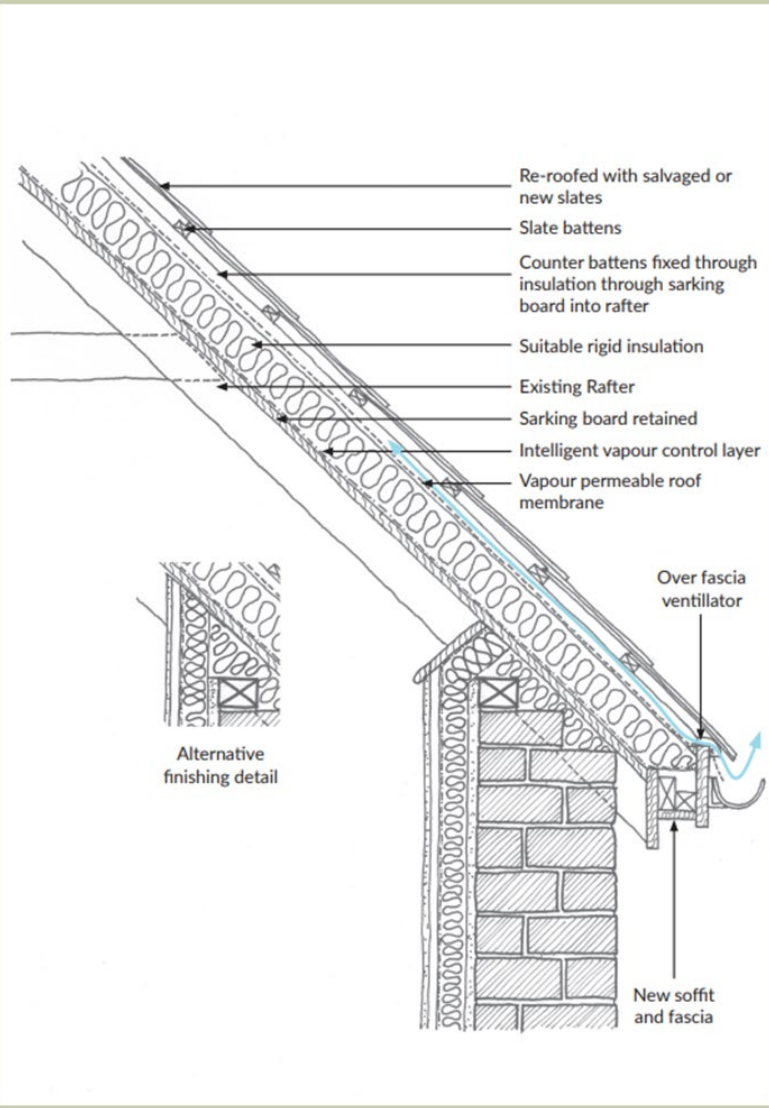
Insulation above and between rafters. An insulating board to the external face of the rafters reduces the chance of thermal bridging but will raise the roof level and may not be acceptable in certain cases
